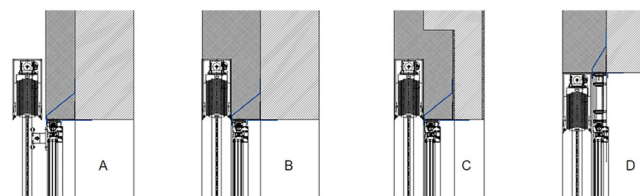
Shading placement options in plane coordination, A: shading in front of the wall structure, B: shading within thermal insulation, C: shading within thermal insulation with a recessed wall reveal, D: shading in front of the window with a frame extension
